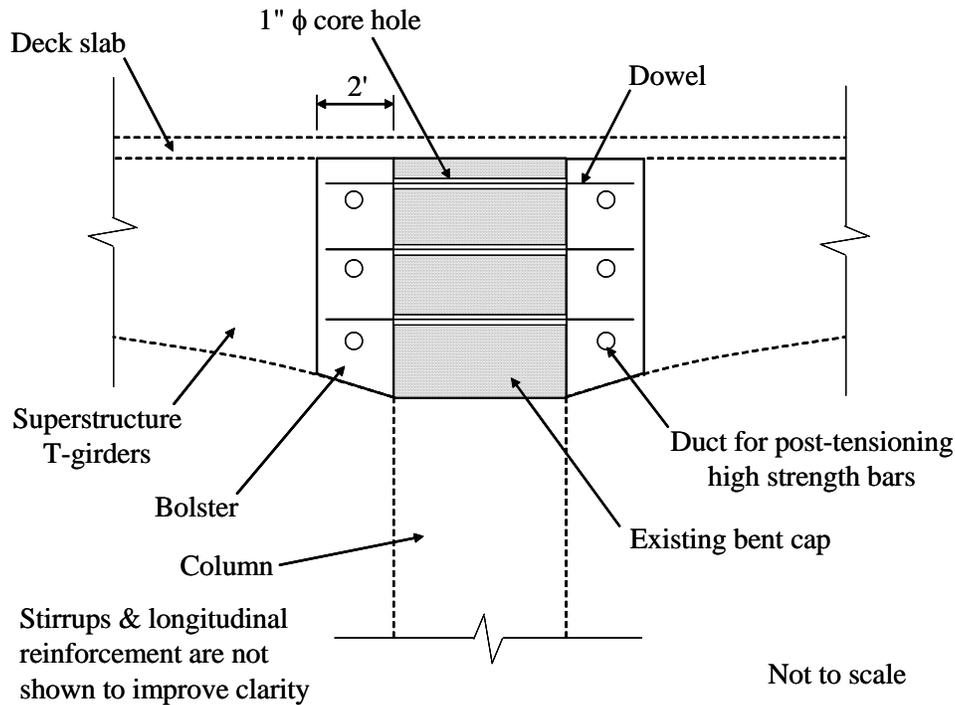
Retrofitting of Bent Caps by Concrete Bolsters
